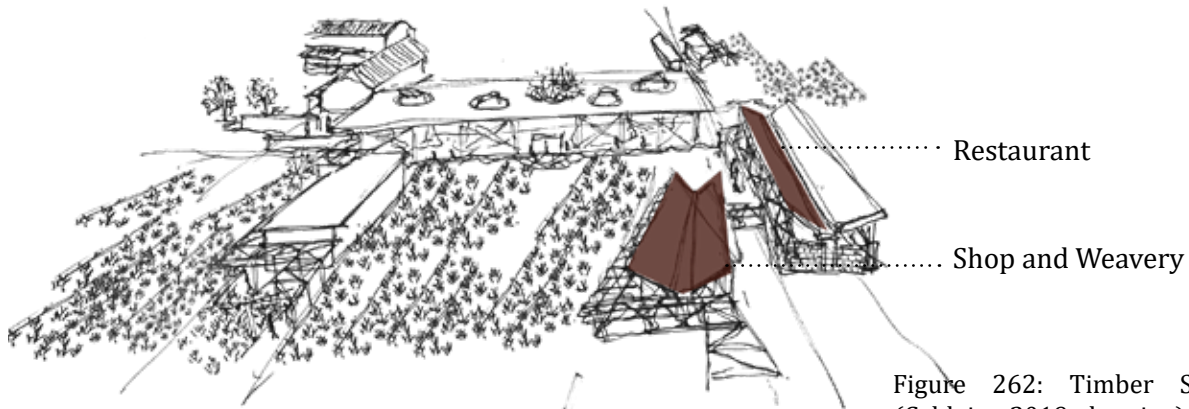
Timber Structures (Caldeira, 2019: drawing).
